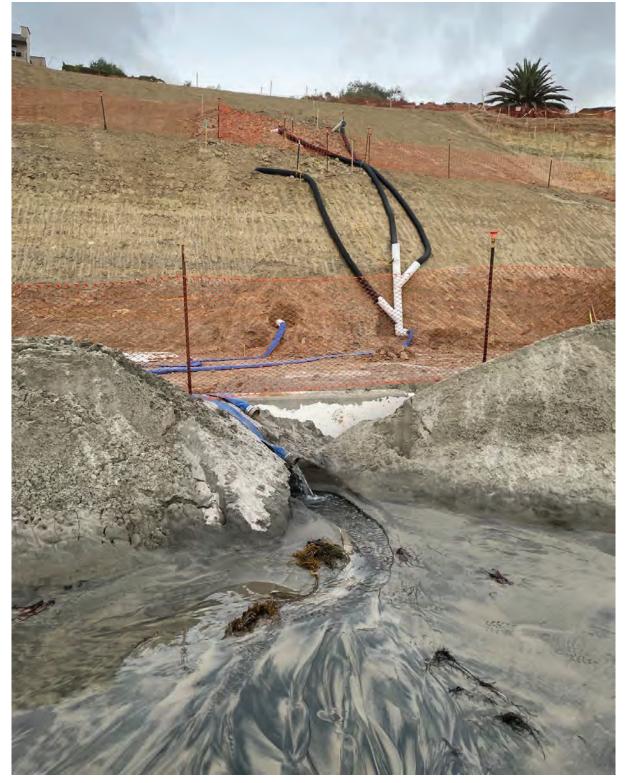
Seawall construction below Del Mar Woods south of 4th St.
